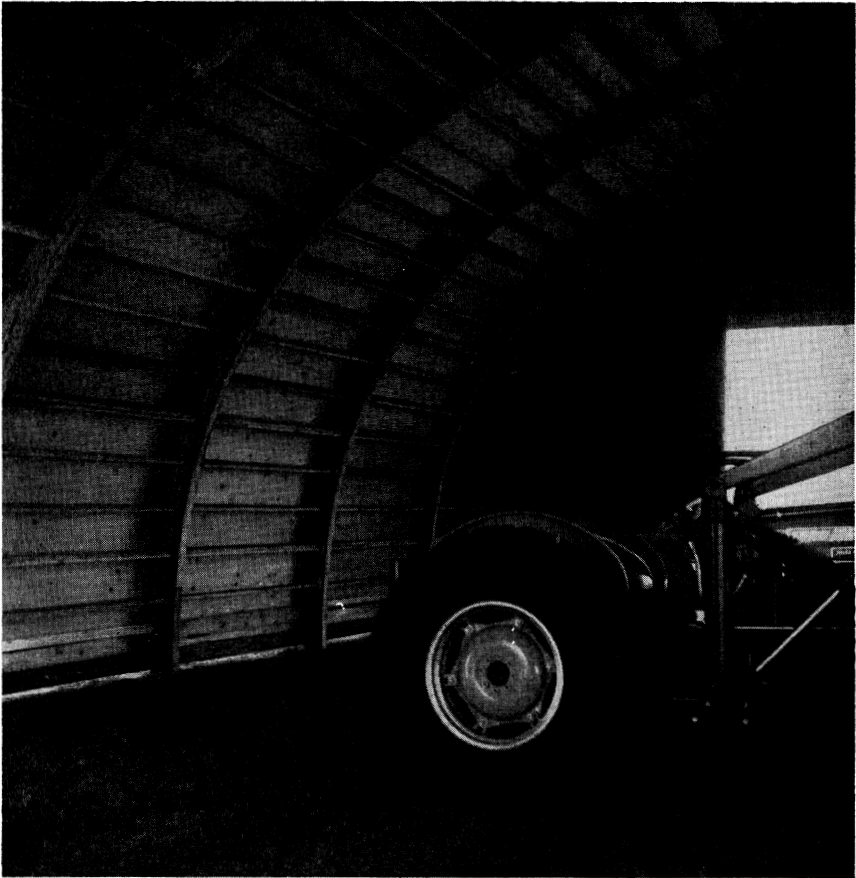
Utility and storage building erected with 4 ft. by 8 ft. plywood stressed-skin panels on glue-laminated arches.
